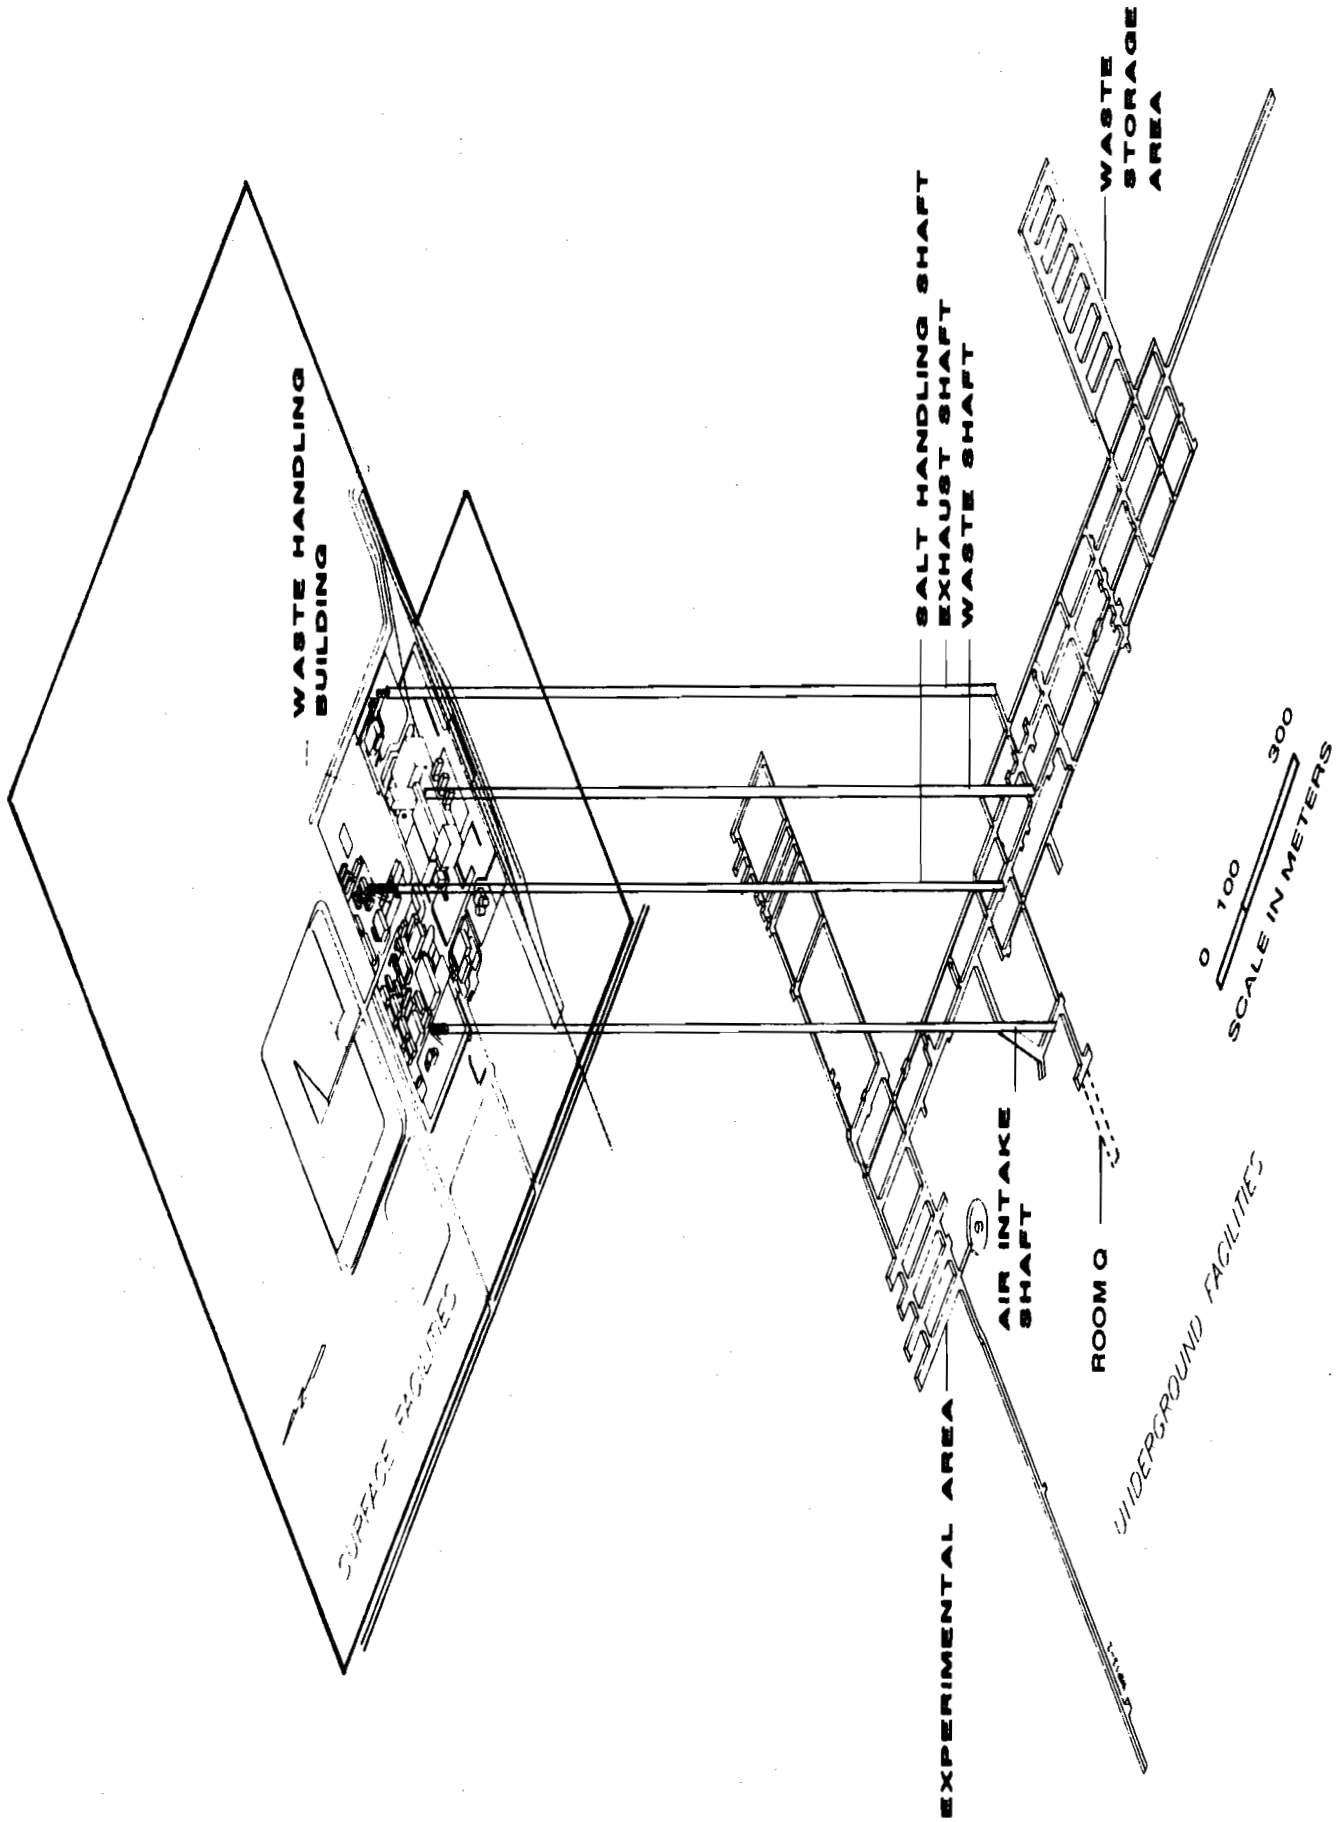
SURFACE AND UNDERGROUND LAYOUT OF THE WIPP FACILITY
